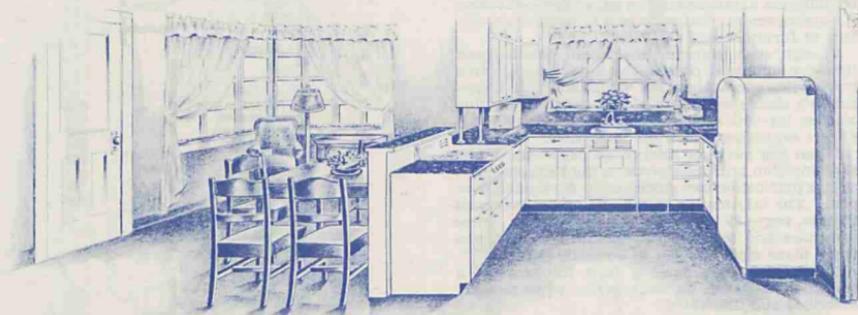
Large room divided by a partial wall into kitchen proper and dining area. Although the room is large, it would take less space in the house as a whole than would a kitchen with some eating space and a separate dining room.
